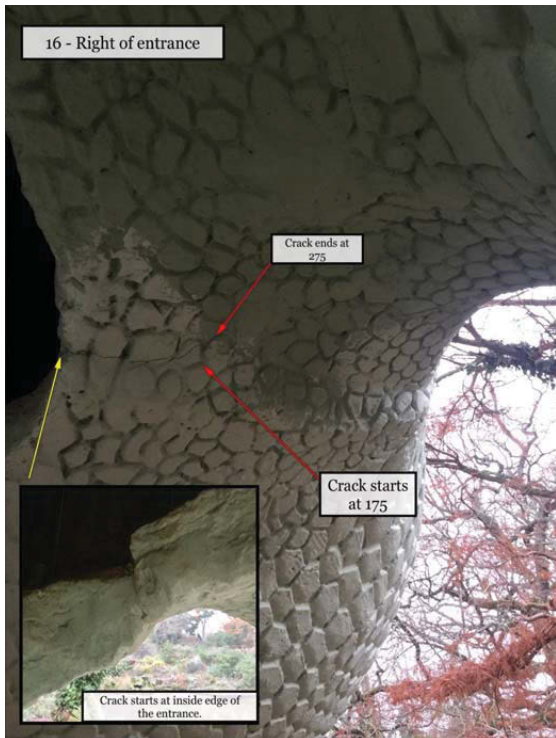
Crack 16a – Photographed 15.12.16<sup>81</sup>
